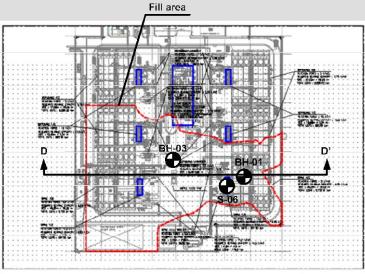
Layout of the Sil Area at Sarulla Power Plant
